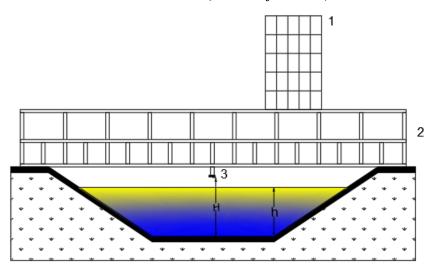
Trapezoidal main canal, bridge section and solar panel (1-solar panel, 2-bridge, 3-ultrasonic sensor)
